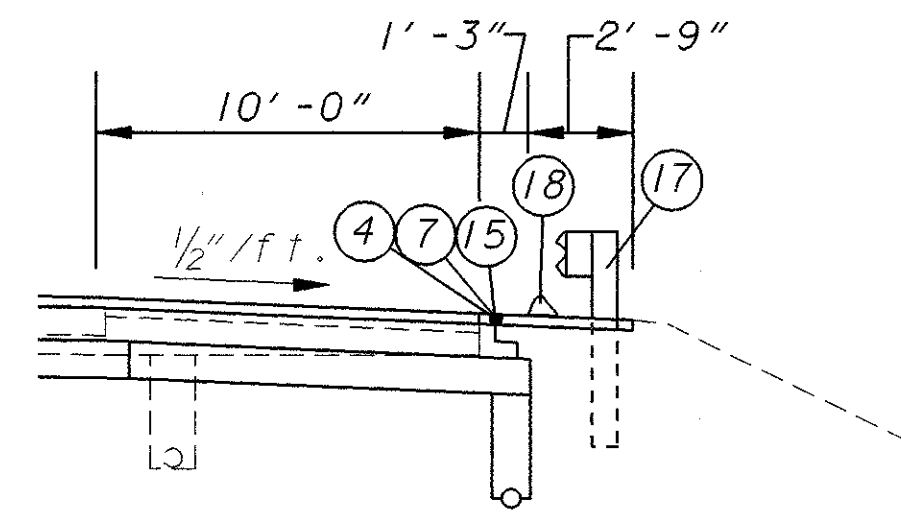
DETAIL A; ROCK CUT UNDERDRAIN (6")
